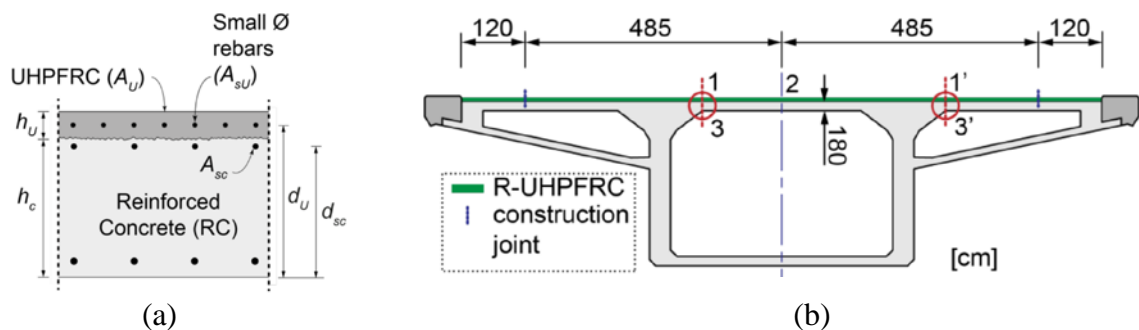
Cross section details of the project (a) Typical composite cross section (b) Geometry of the box girders cross-section
